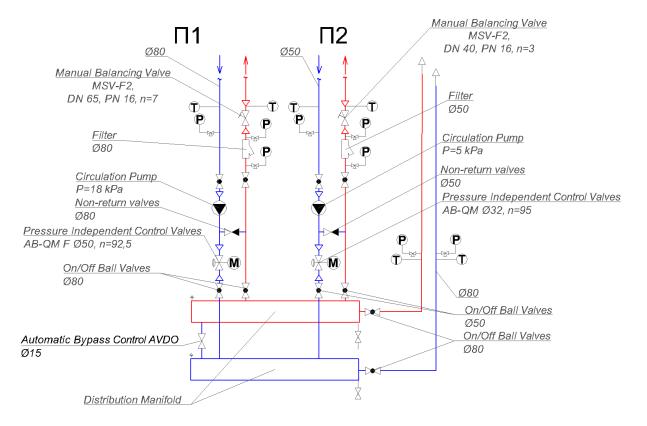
Schematic Diagram of Water Heater Piping for Ventilation Systems
